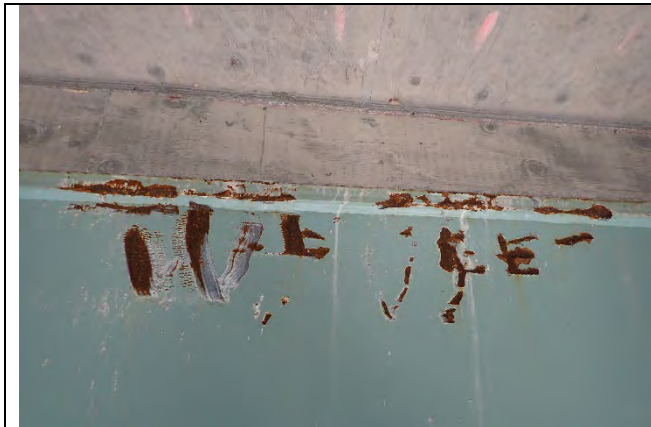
Typical Example of Drilled Hole Retrofits at Girder Bottom Flanges/Tie Plates.
